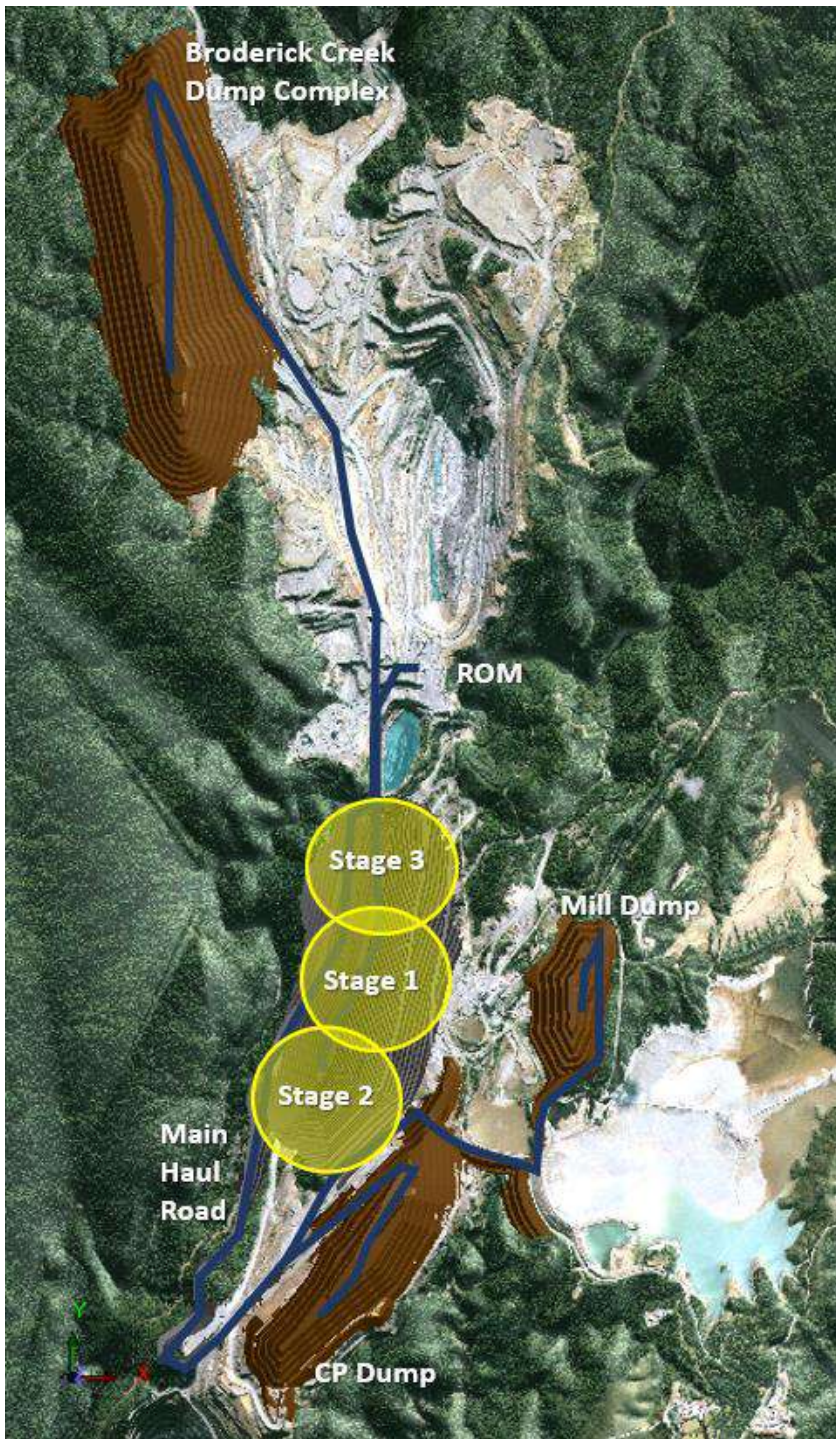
Site plan showing new Centre Pit extent and infrastructure on site
